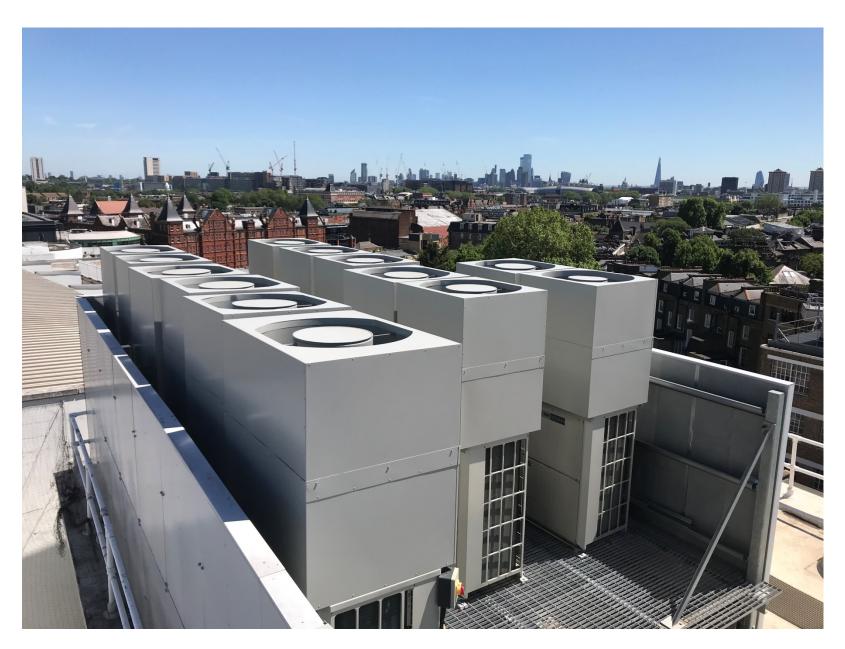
Photo E: View of plant enclosure on roof of Academic House, 24-28 Oval Road, London NW1
